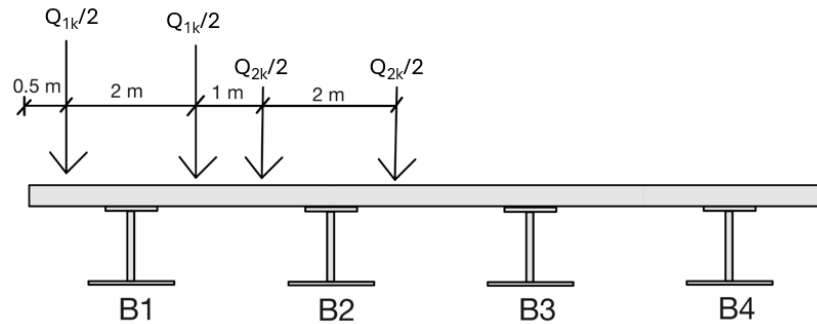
Placement of LM1 axle loads that yield the highest load effects in any girder of the bridge, which will be in the outer girder, B1.
